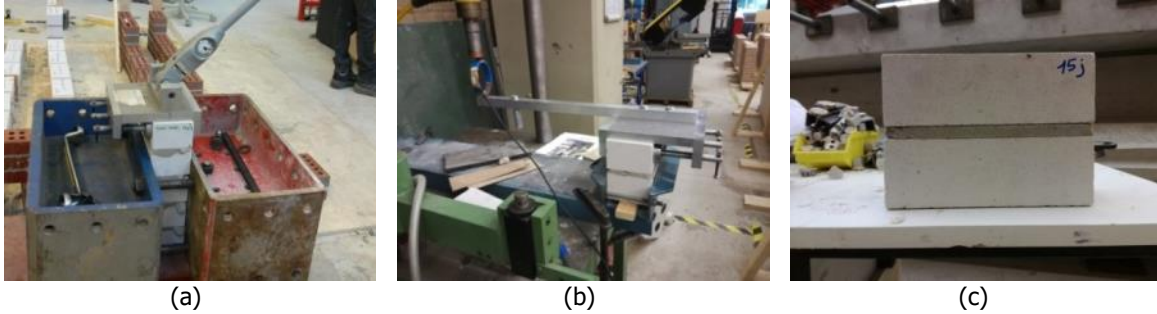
Bond wrench tests: (a) bond wrench set-up used in the previous campaigns; (b) improved bond wrench set-up used in this campaign; (c) couplet specimen.
